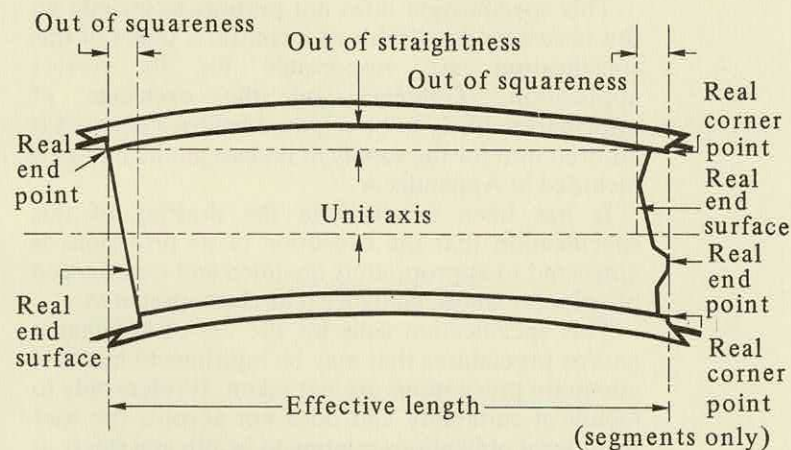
Section through or plan of a nominal straight lining unit (Diagrammatic only)
